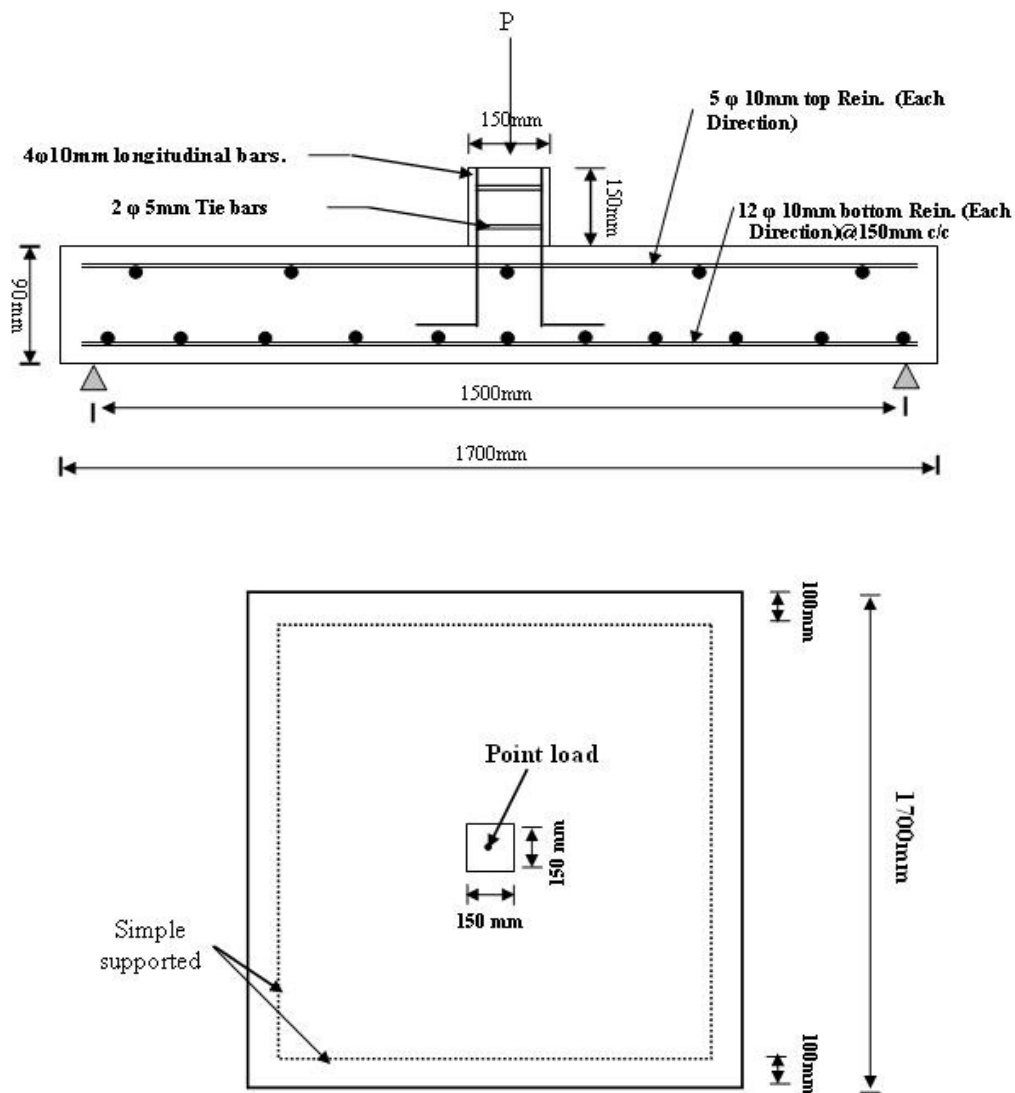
Geometry, boundary conditions, loading arrangement and reinforcement details of slab HS11
